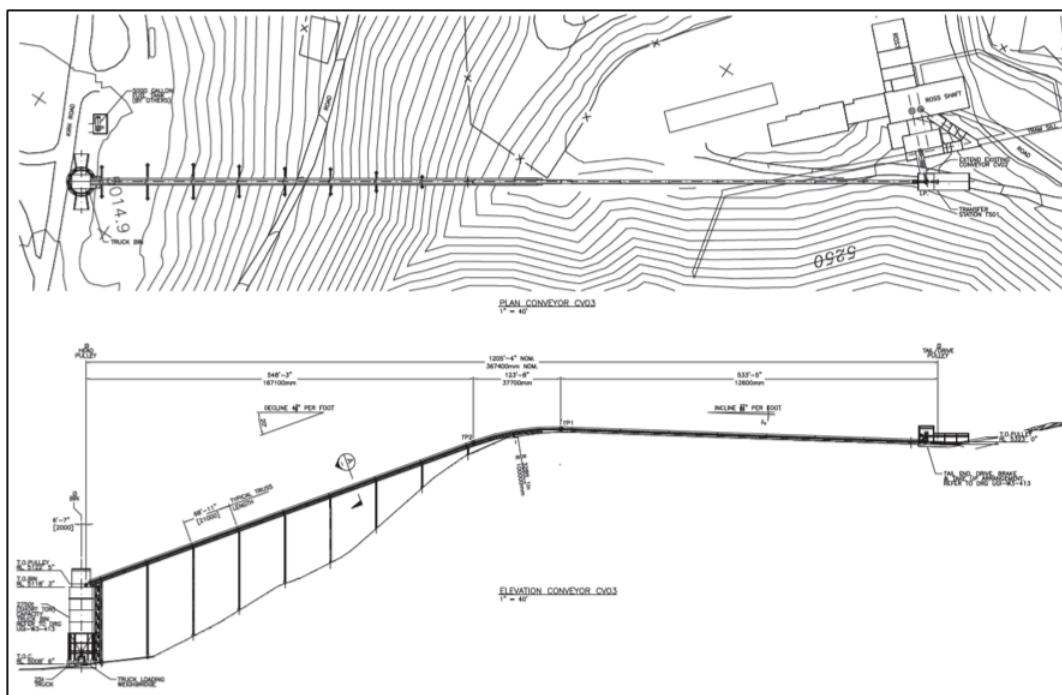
Waste rock handling system route (SRK, Courtesy SURF)
